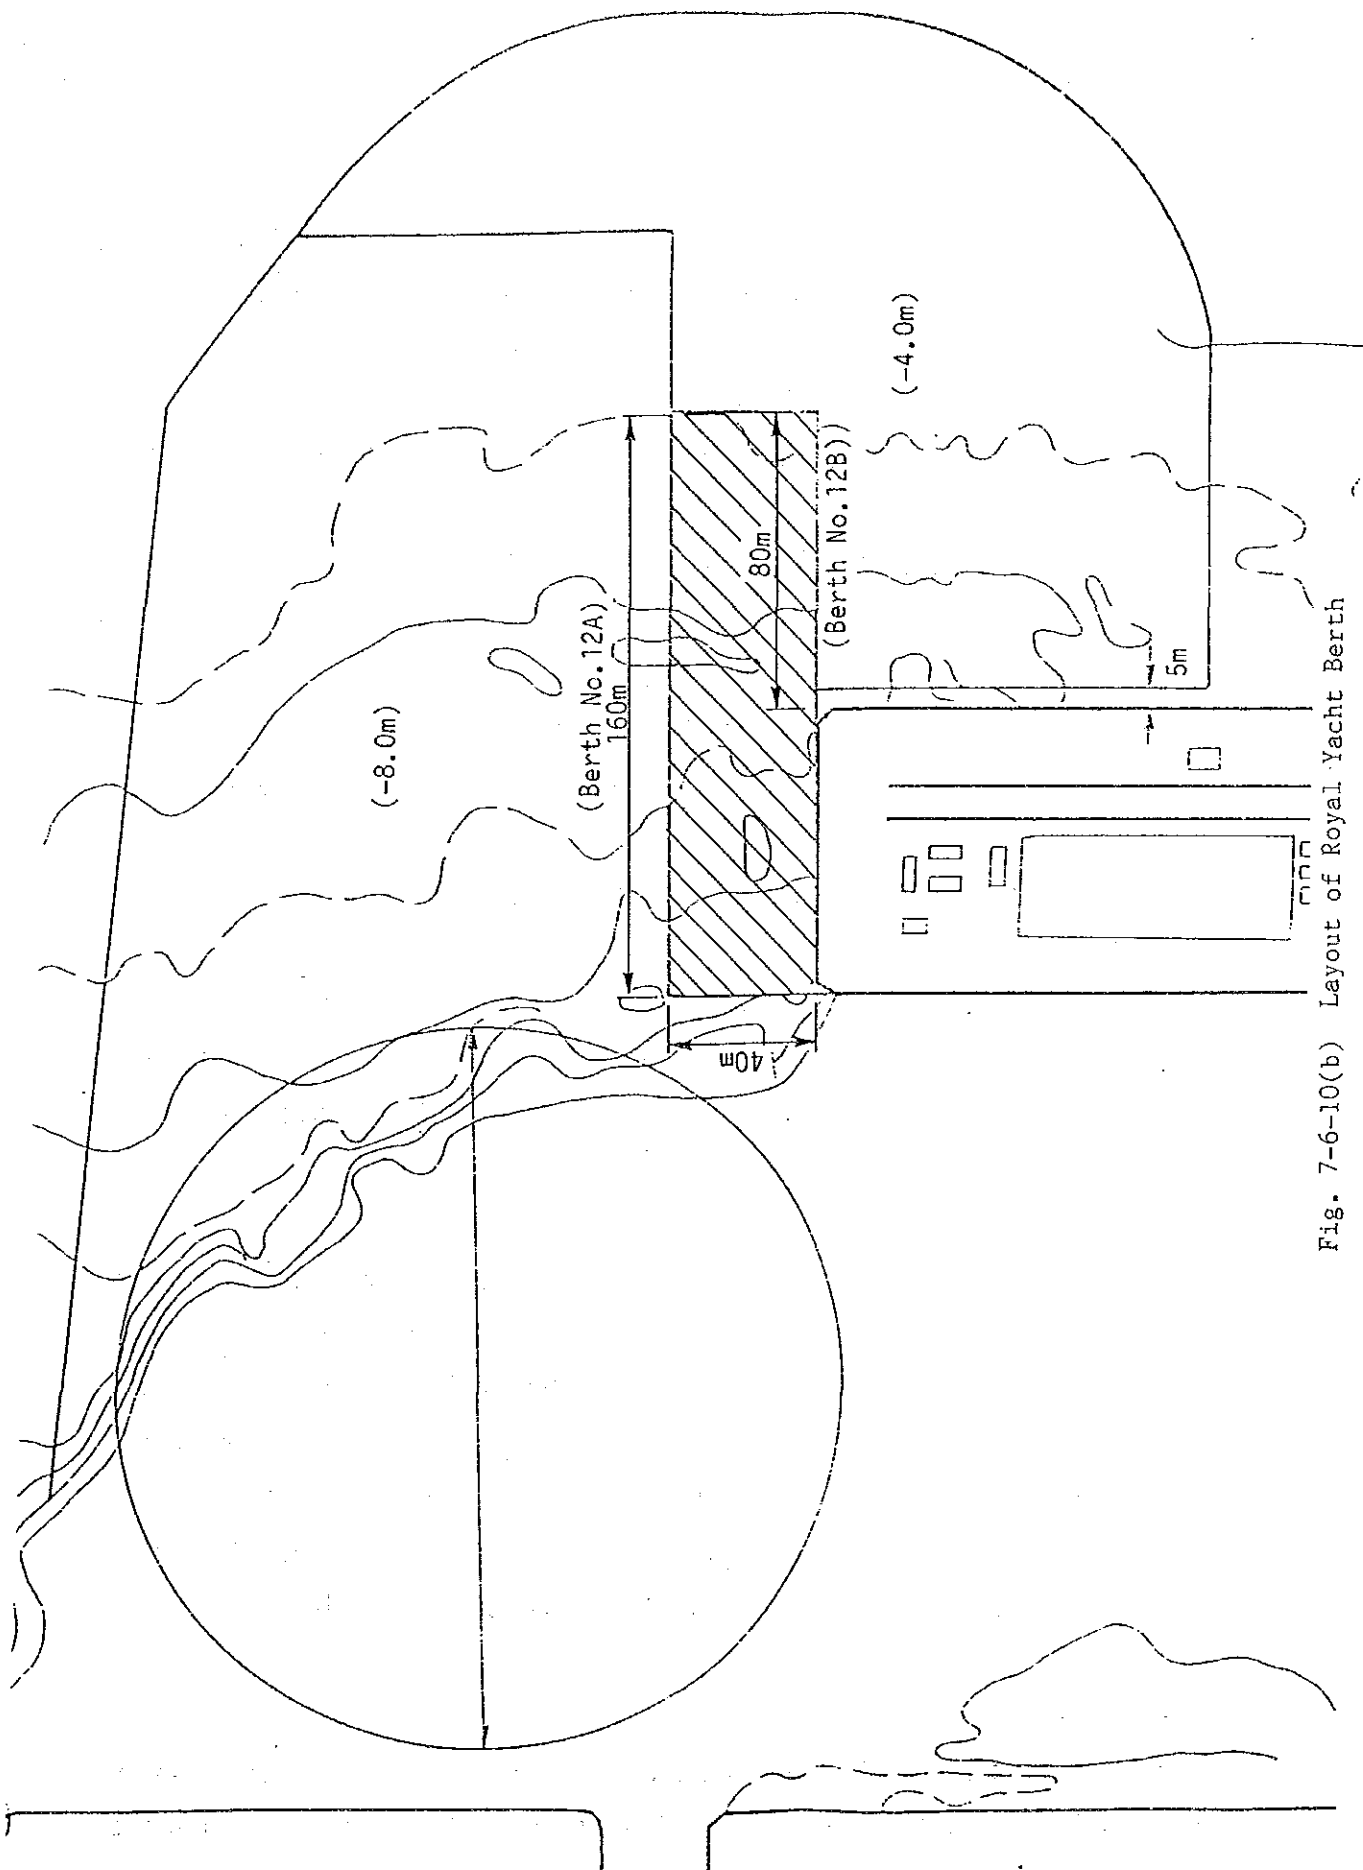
(b) Layout of Royal Yacht Berth
